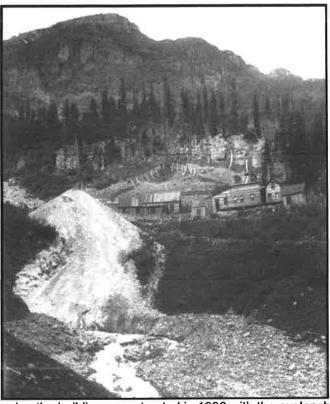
Silver Crown Mine showing the buildings constructed in 1906 with the avalanche splitting berms on the slope above.
